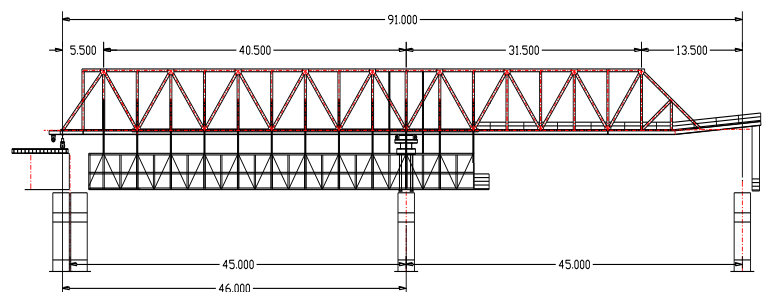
Vasco da Gama Bridge – rear support location at construction joint
